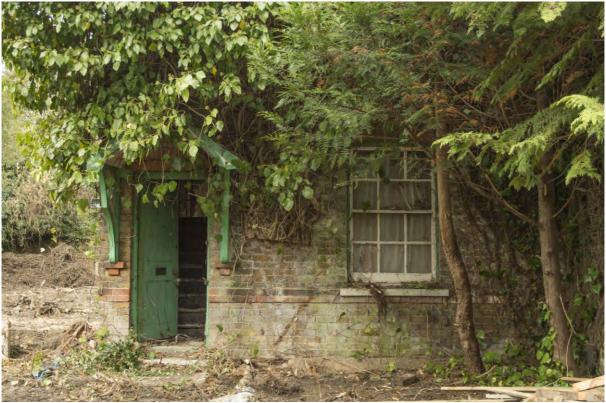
The principal elevation of no.15 (HRI17-0020)
